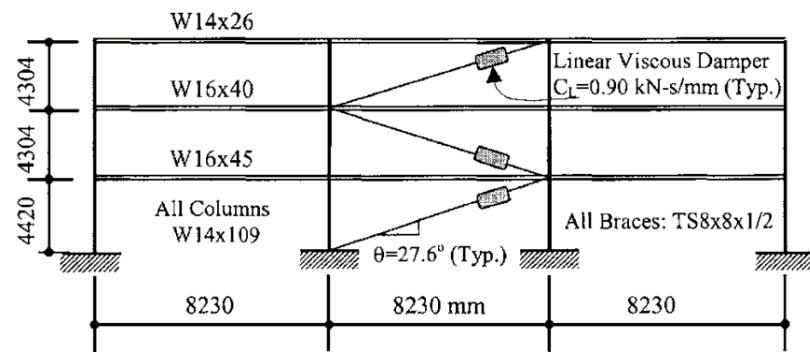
Steel frame with damping systems used by Pavlou and Constantinou (2006).
